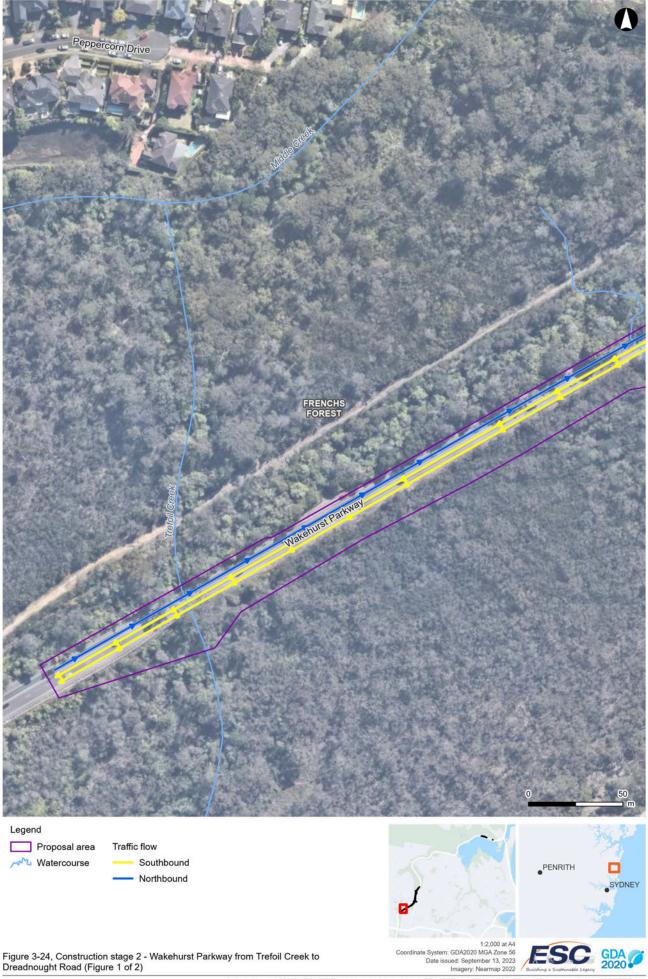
, Construction stage 2 - Wakehurst Parkway from Trefoil Creek to Dreadnought Road (Figure 1 of 2)
